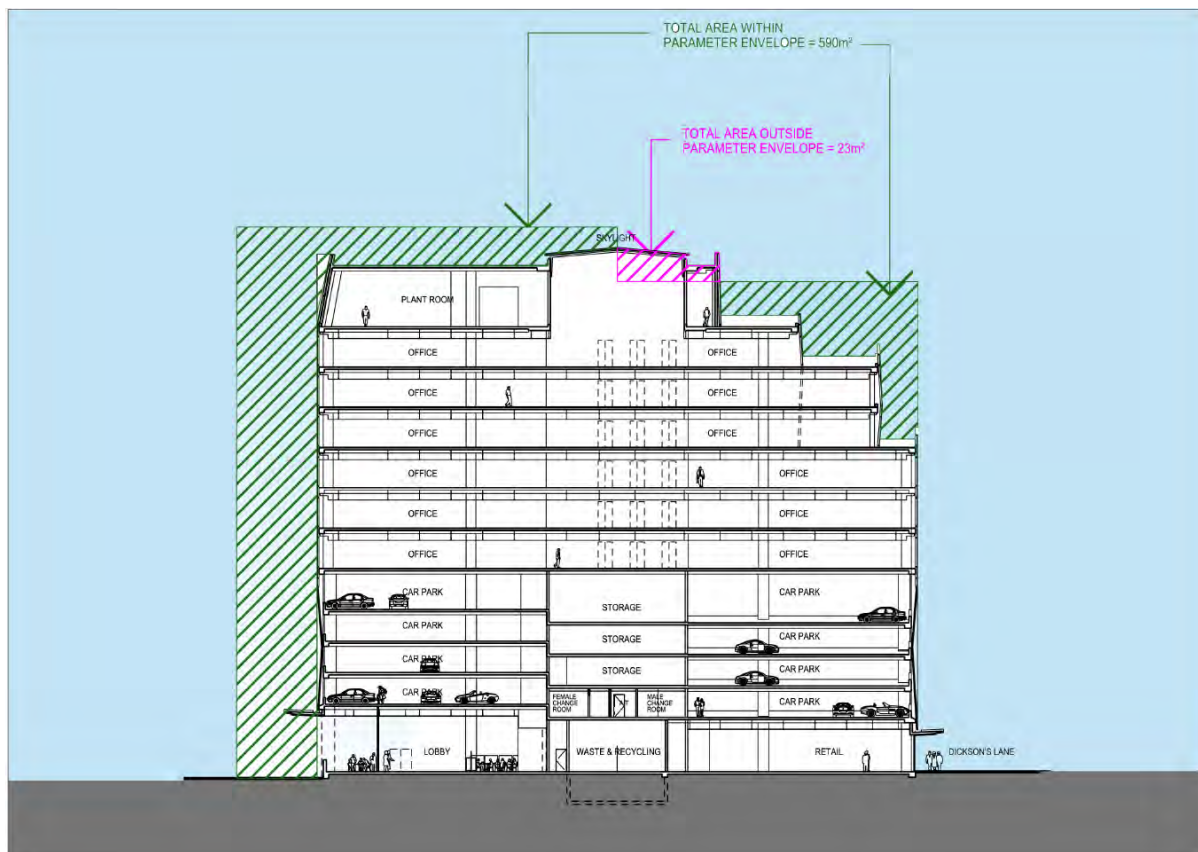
Comparison of SSDA4 detailed building design to SSDA2 Concept Proposal building envelope
